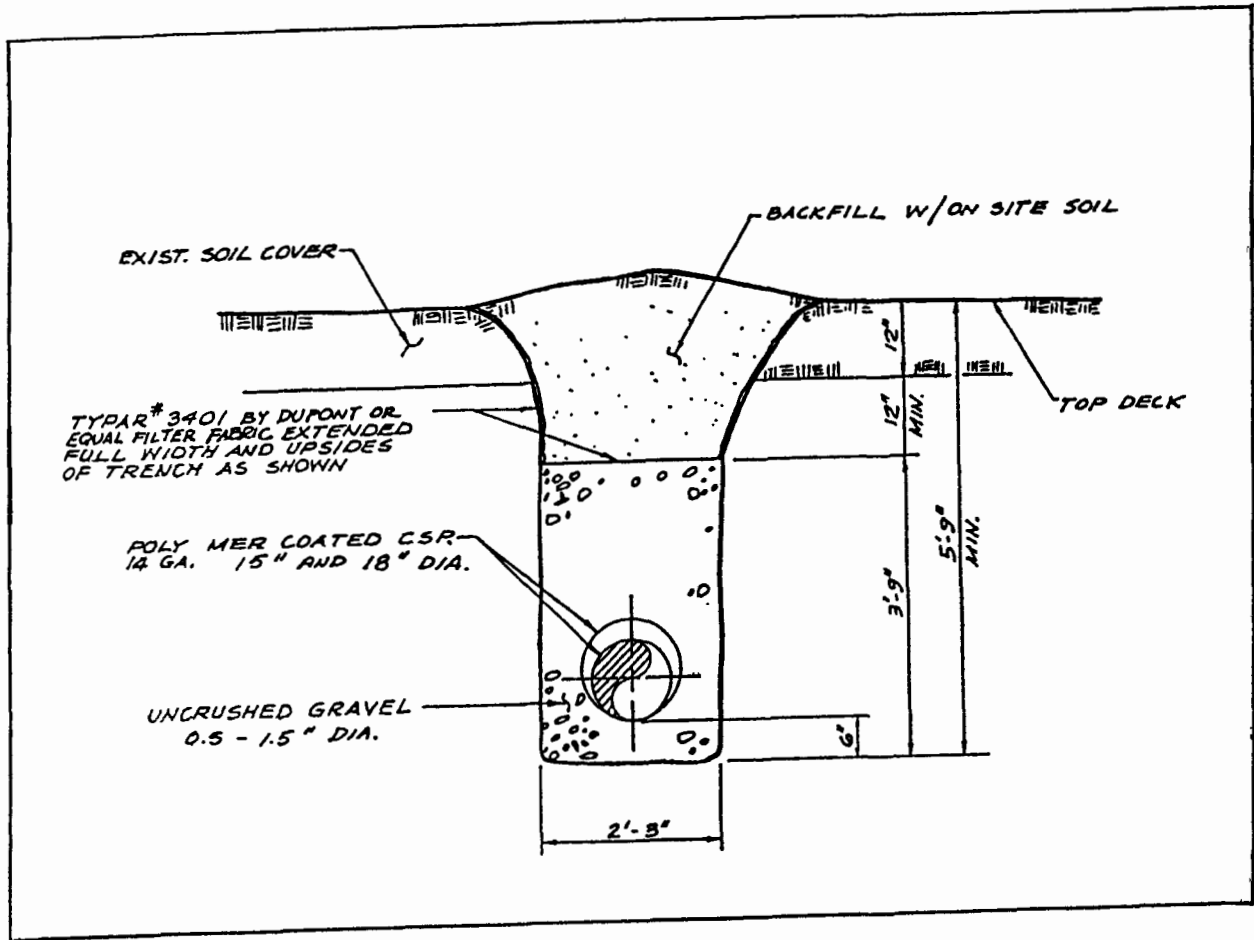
Horizontal Collector - Trench with Casing and Backfill
